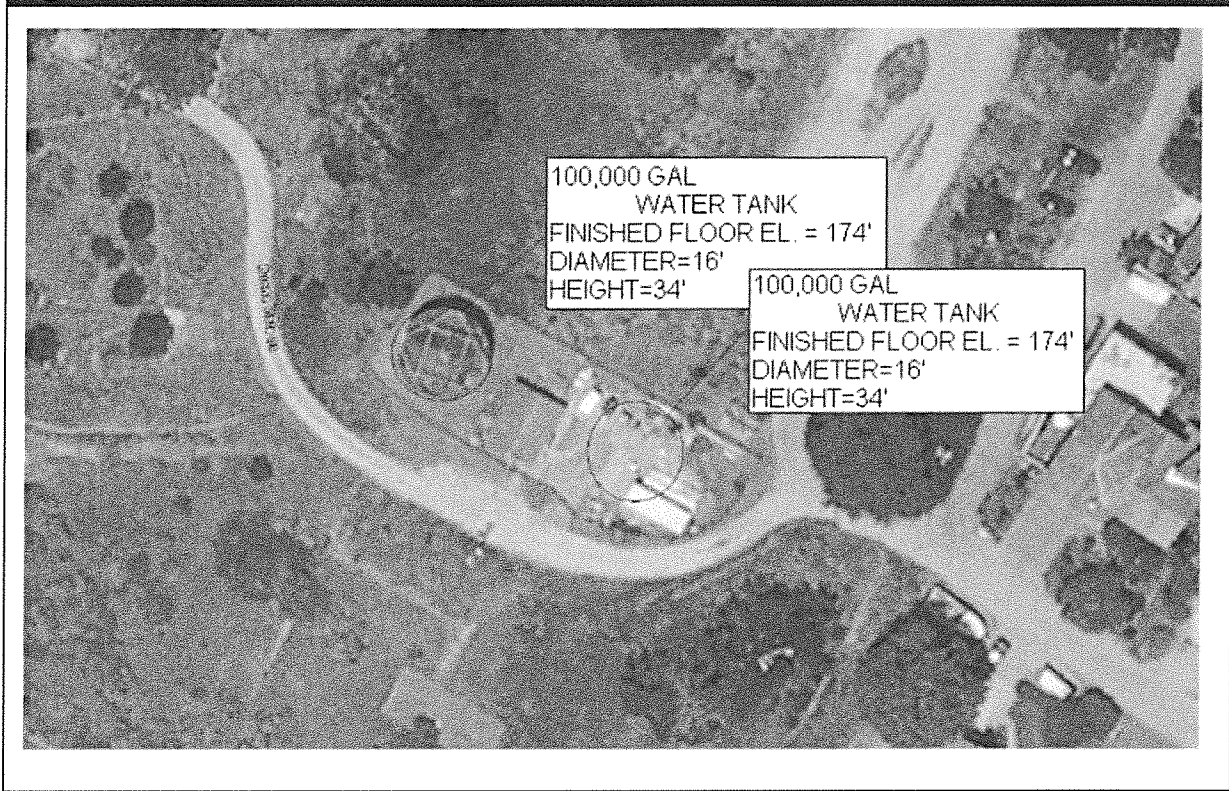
Proposed Schoolhouse Tank Site Plan
